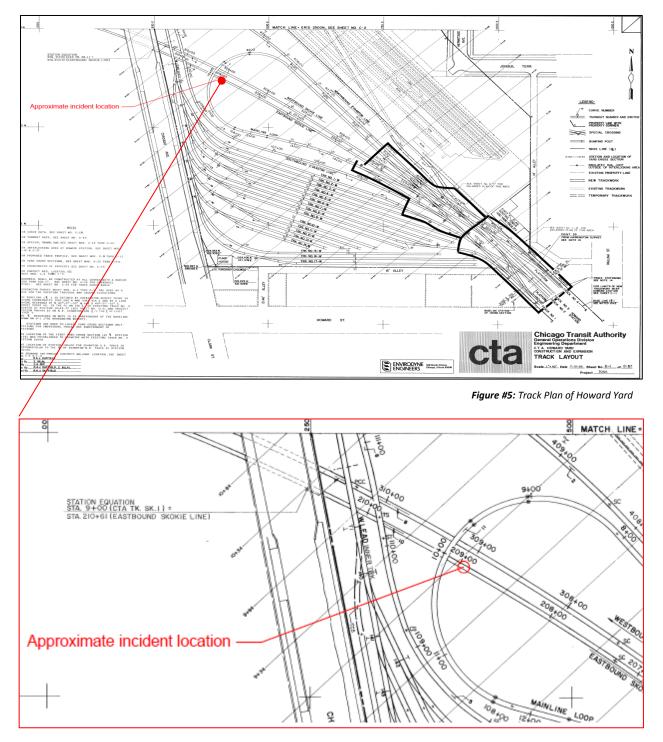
Expanded Track Plan of Howard Yard and Accident Site
